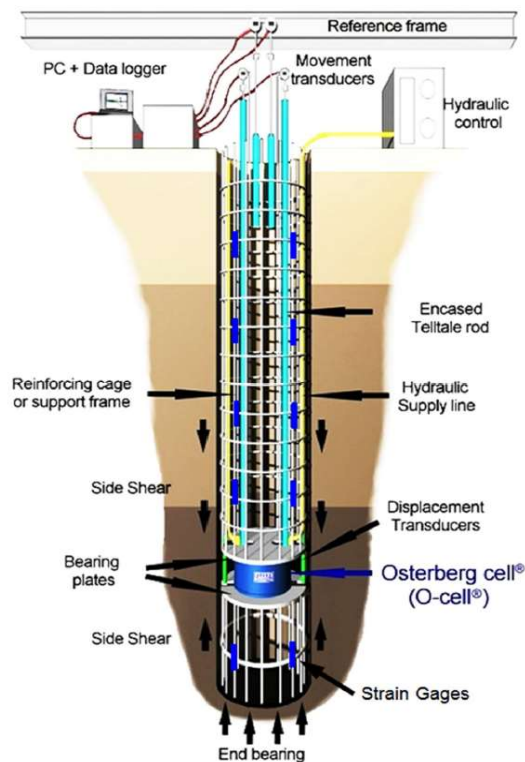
13 Typical arrangement for a bidirectional load test (www.Loadtest.com).
